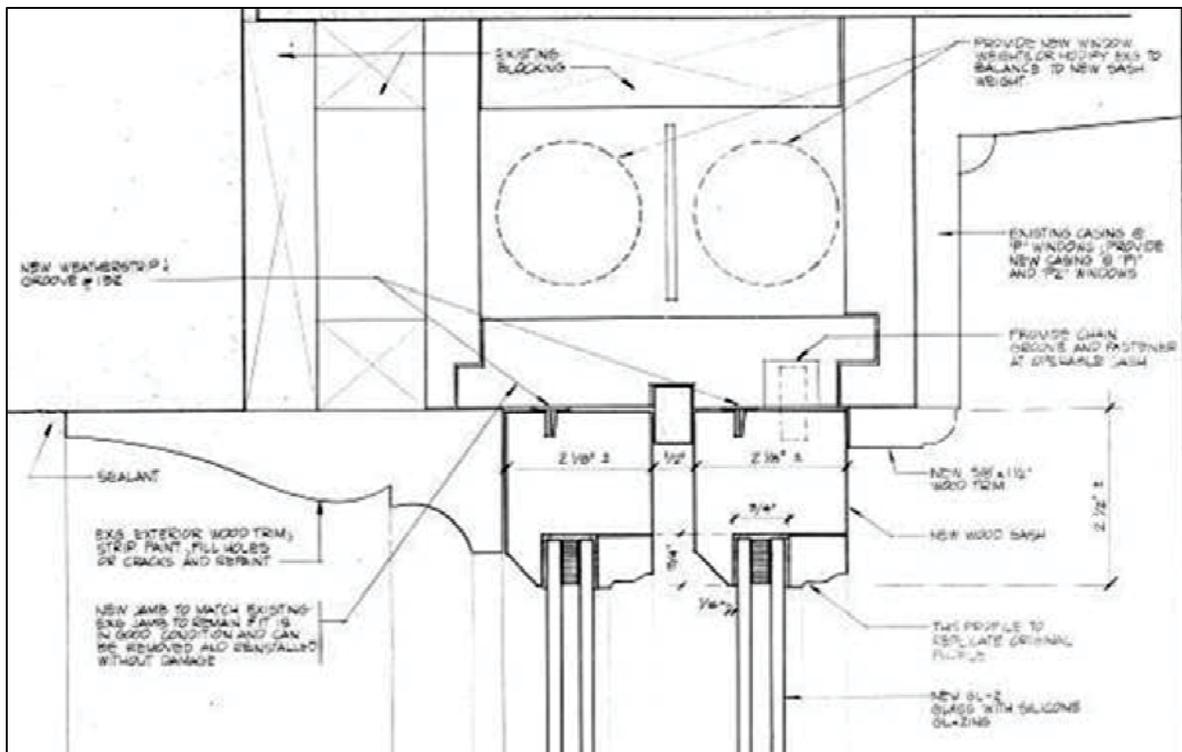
Typical detail for a custom wood window sash replacement and frame restoration – Jamb detail from the Ohio Statehouse
